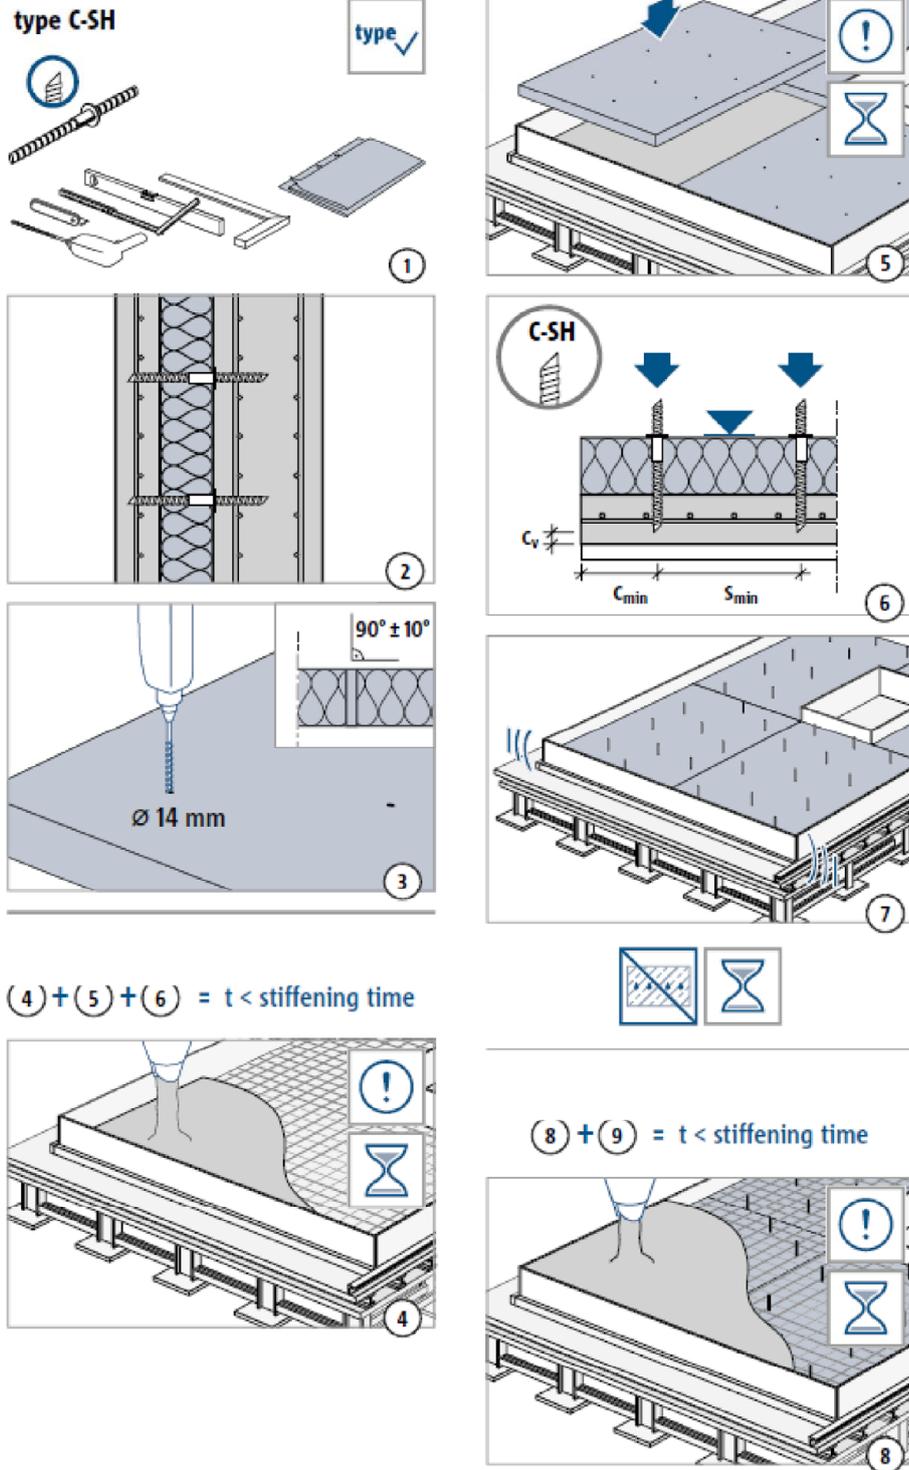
Installation instruction - Schöck Isolink® for sandwich wall – page 1
